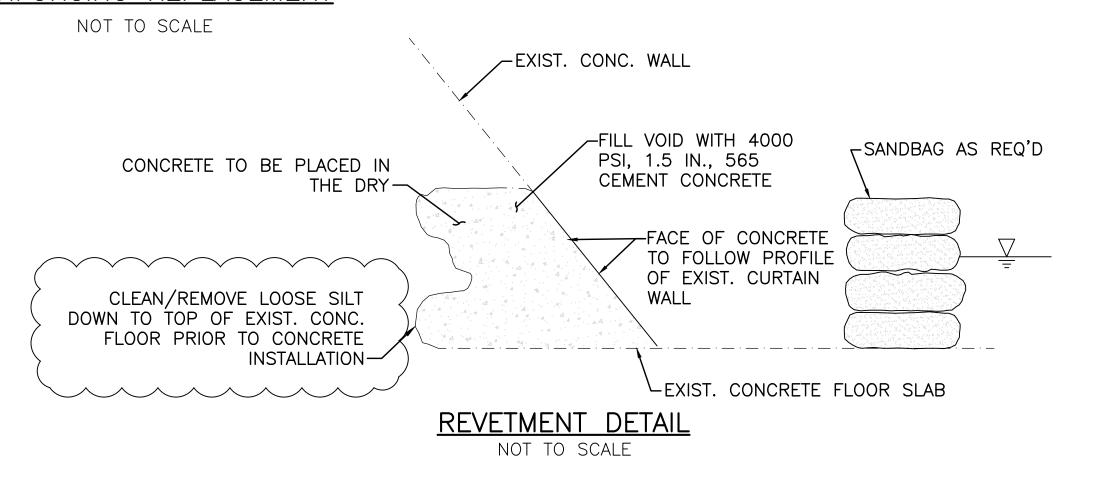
SHALLOW DEPTH SUBSTRUCTURE REPAIR
